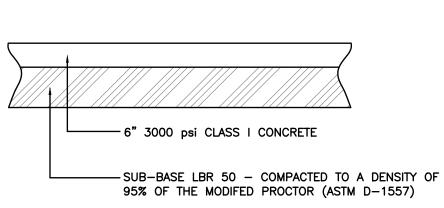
DETAIL REMOVAL AND REPLACEMENT OF CONCRETE DRIVE
